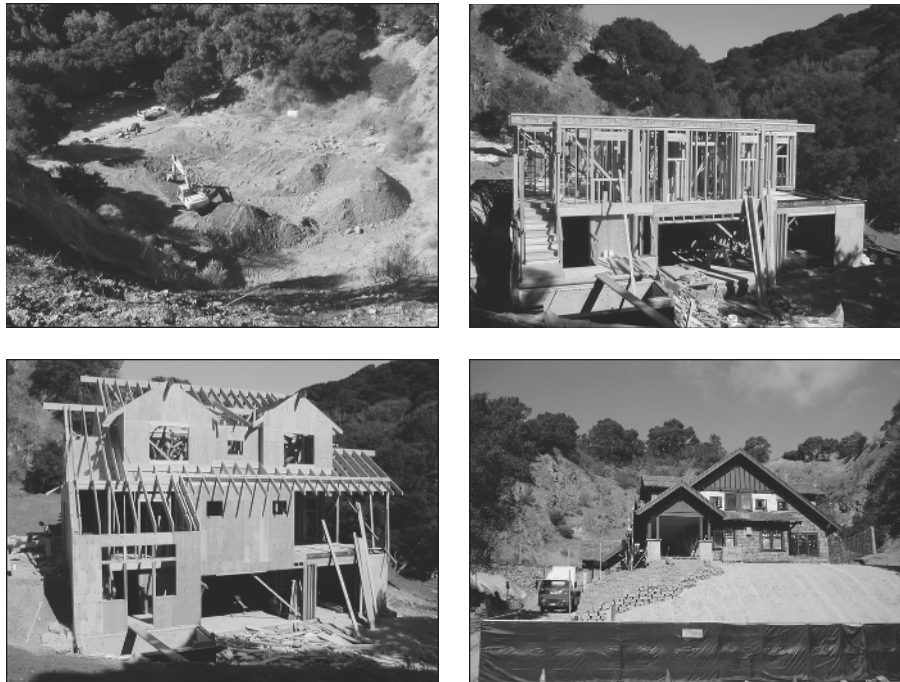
A house in progressive stages of construction. From site prep through foundation, framing, and exterior work, this home took more than eight months to build.
